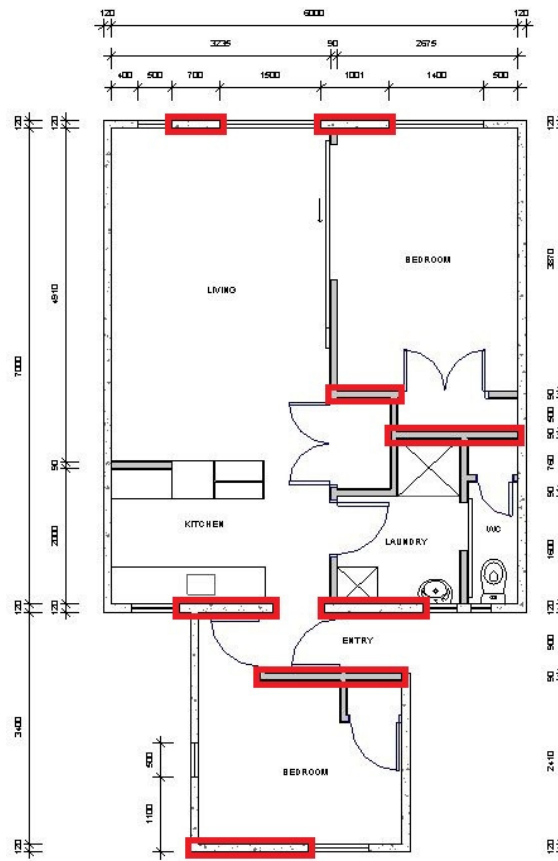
Walls used for bracing in the longitudinal direction, 2 bedroom unit.
